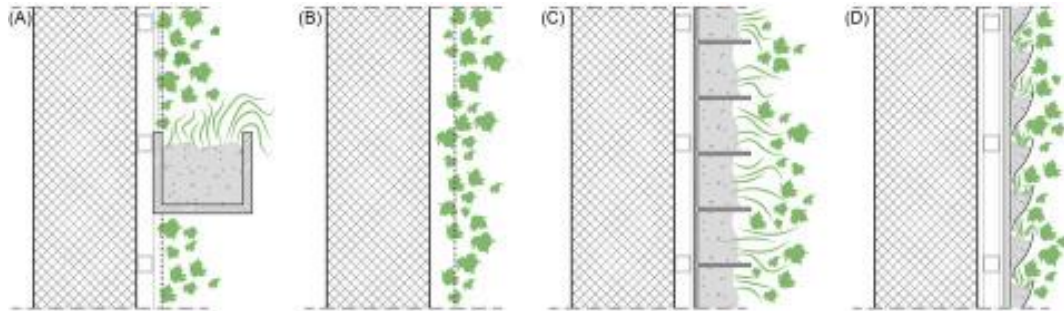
(A) Green facade with planter boxes, (B) Green facade direct greening, (C) Living wall soil cell system, (D) Living wall hydroponic system (Fernández-Cañero, et al., 2018)
